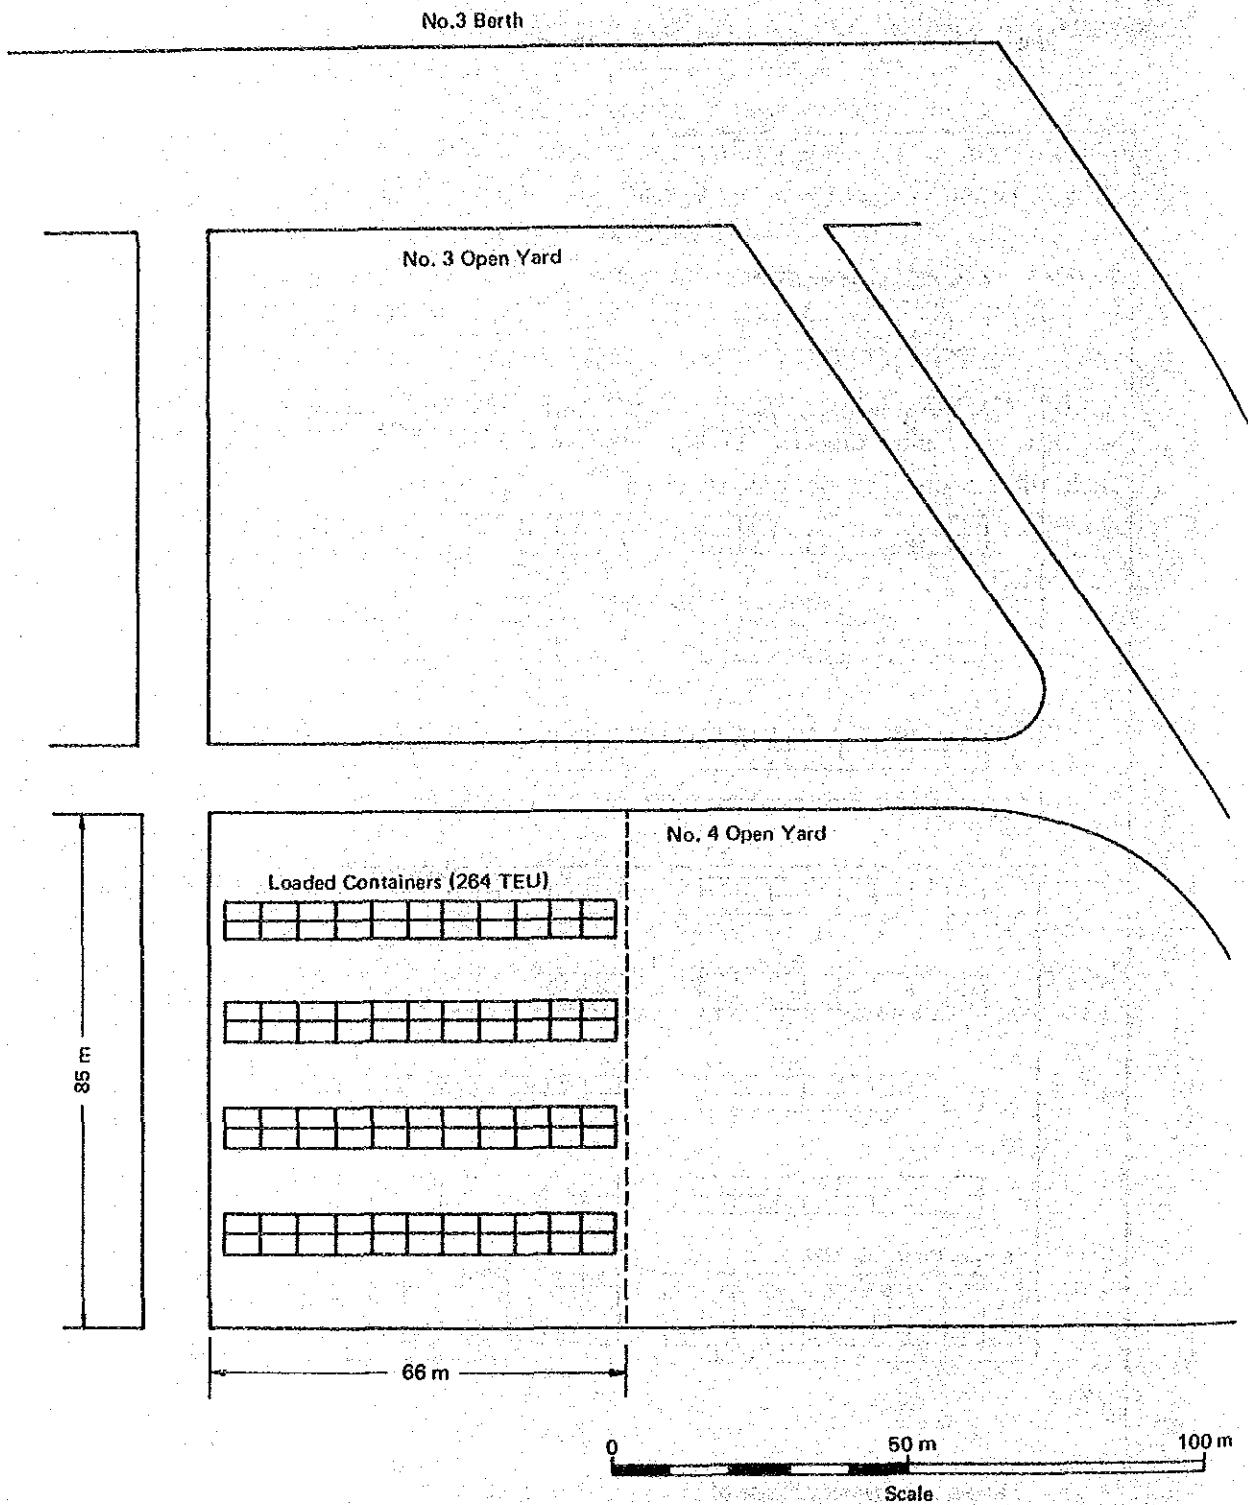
(b) Container Yard Slot Arrangement Plan
